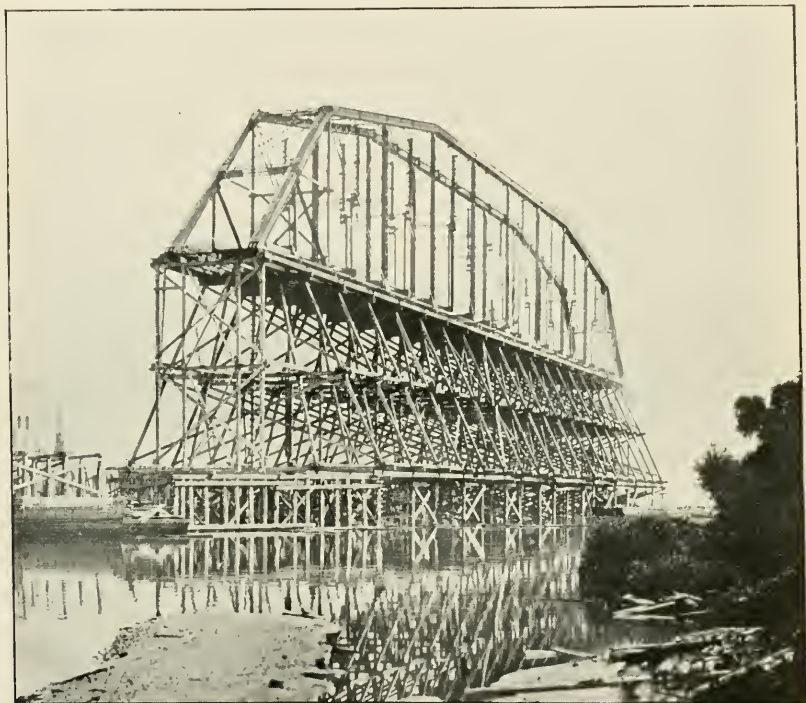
OHIO CONNECTING RAILWAY BRIDGE NEAR PITTSBURG.
